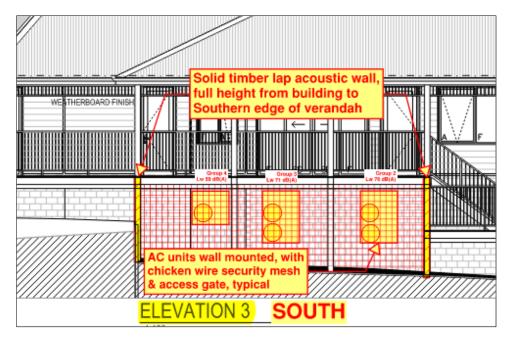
AIR CONDITIONING - GENERAL ARRANGEMENT SOUTH
